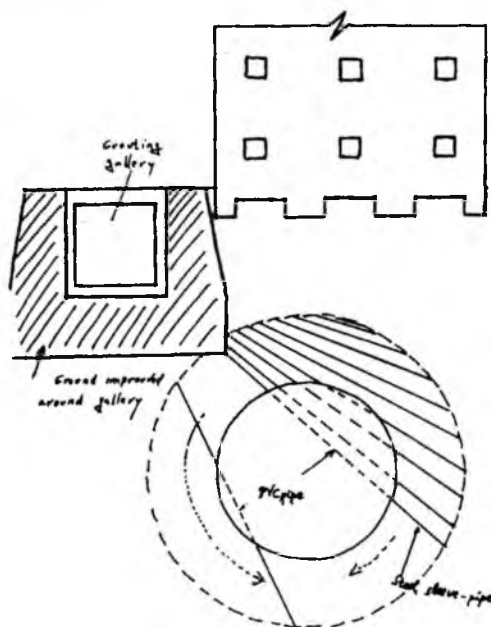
"Primary lining" of tunnel by means of ground treated ahead of tunnel excavation (schematic section)
